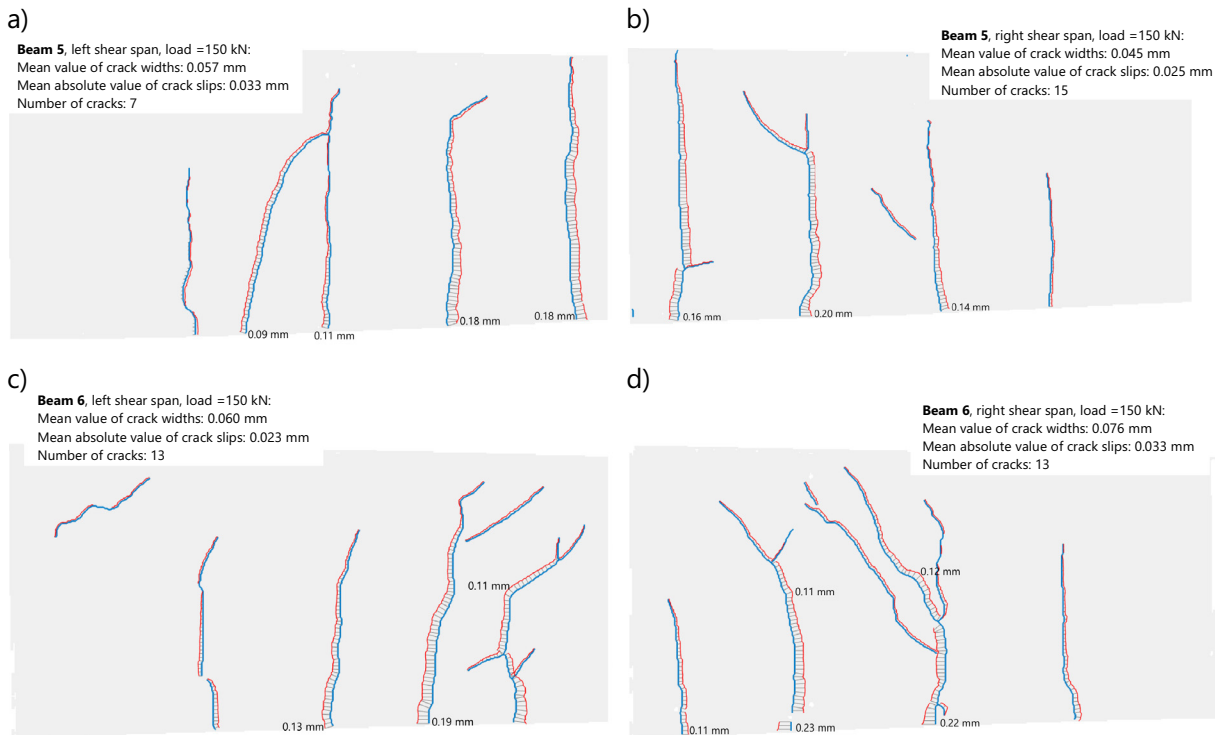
Crack patterns and widths of the beams at a load of 150 kN: a) and b) Beam 5 (five prestressed stirrups), c) and d) Beam 6 (five non-prestressed stirrups).
